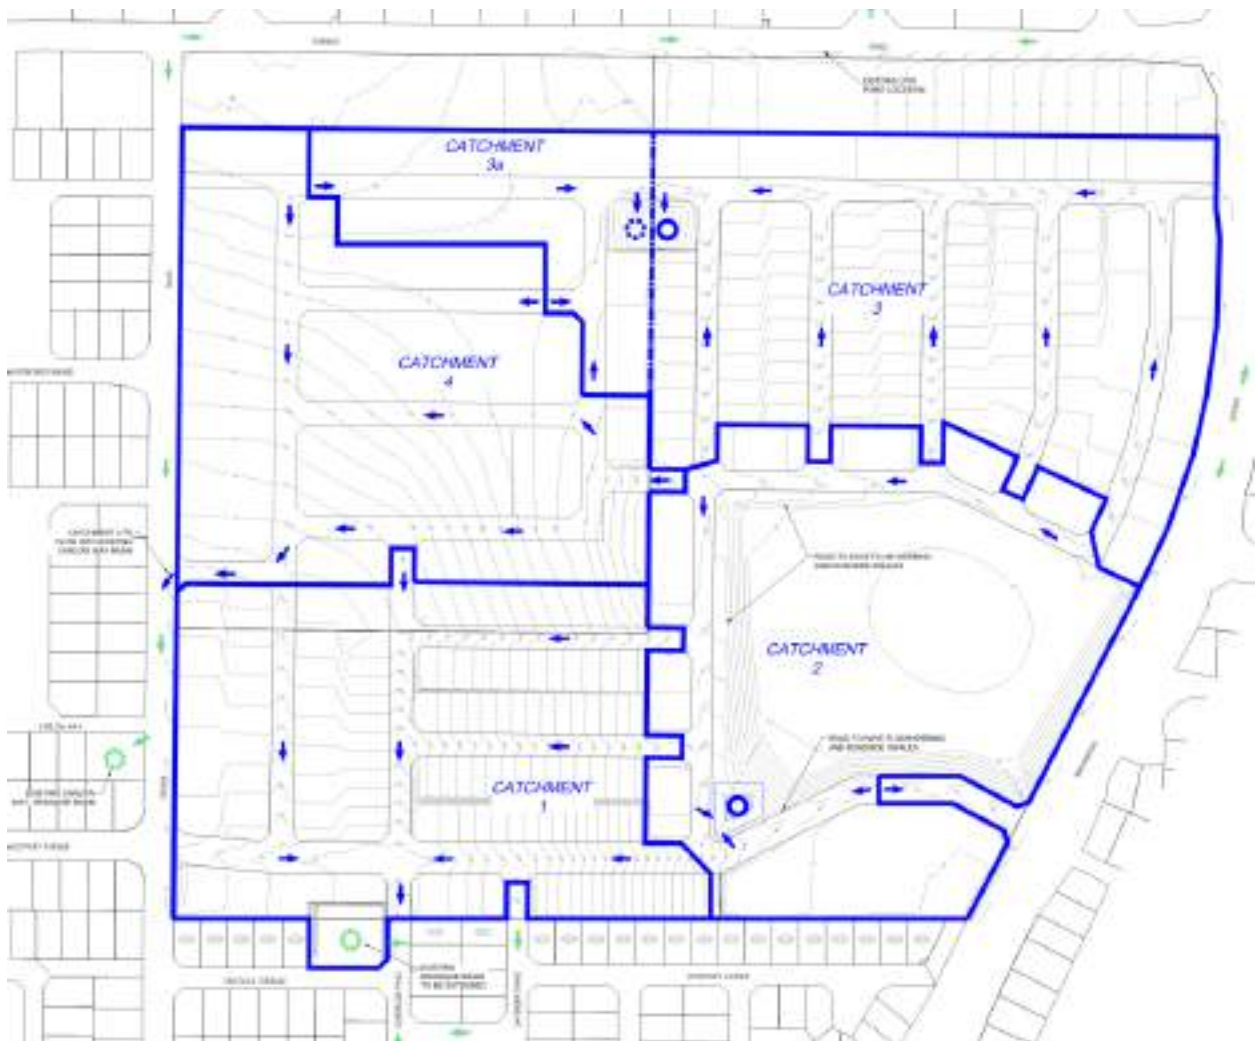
Stormwater Drainage Catchment Plan, August 2019 (TABEC)
